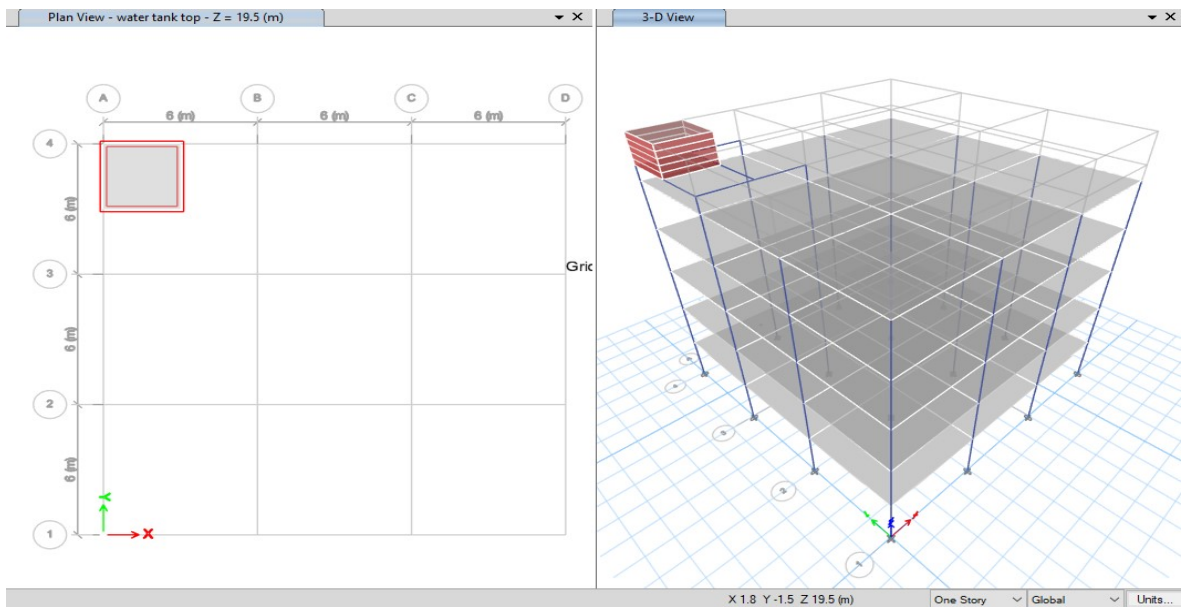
Plan & 3D view of G+4 Model with Water Tank
